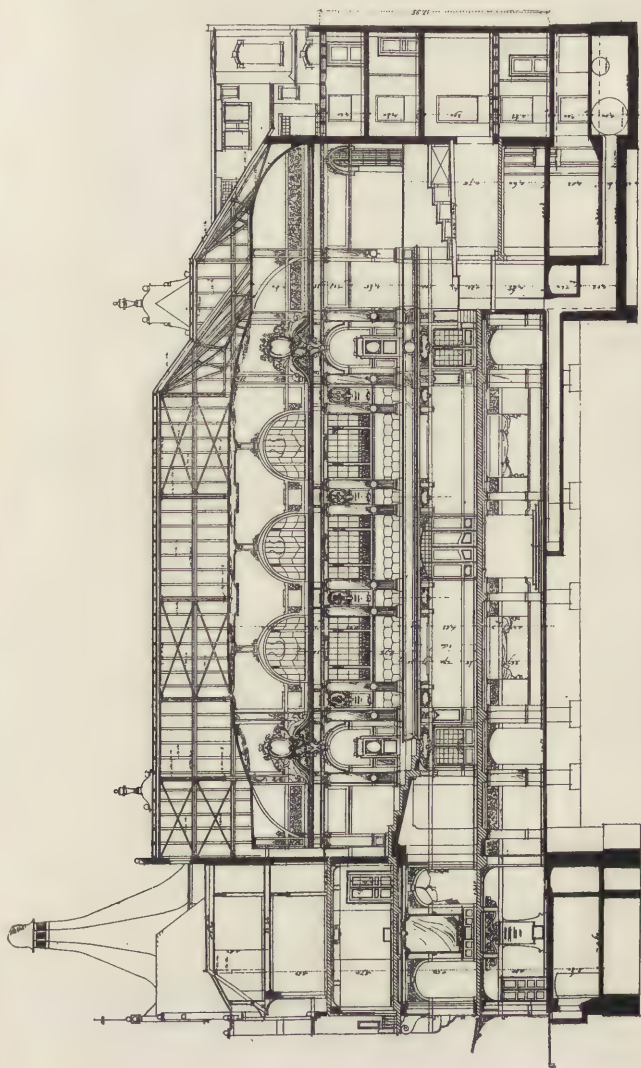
Longitudinal Section, Concert Hall, Strasbourg.
